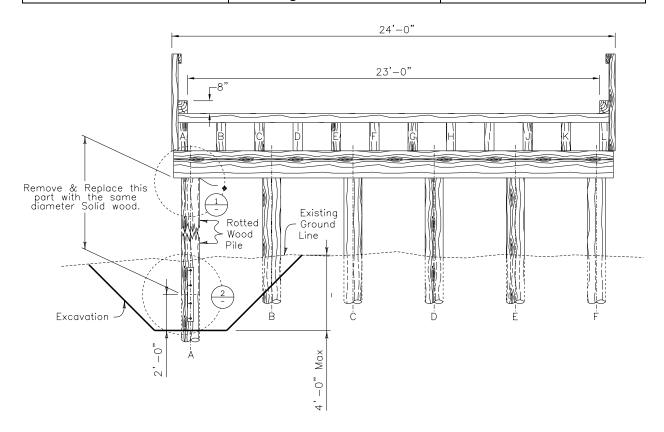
(G)-7 Sample Section of Replacing Portion of Timber Pile
